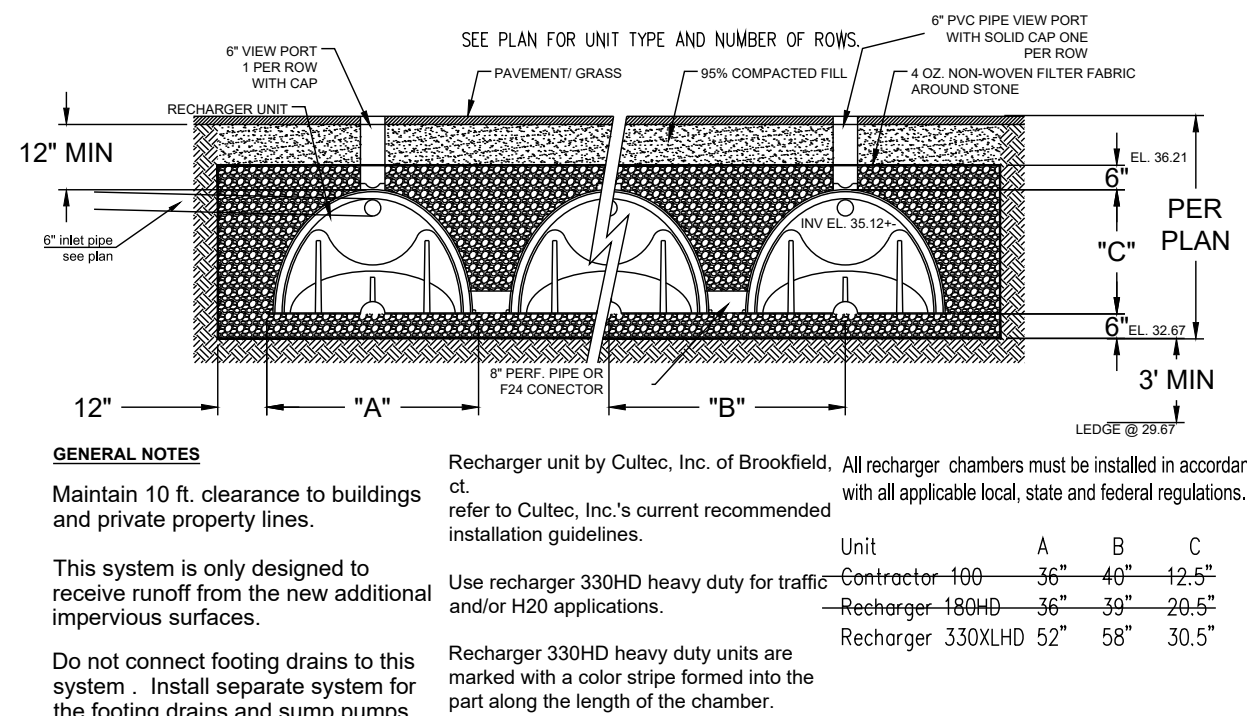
DETAIL OF TYPICAL TRENCH SECTIONS N.T.S.
